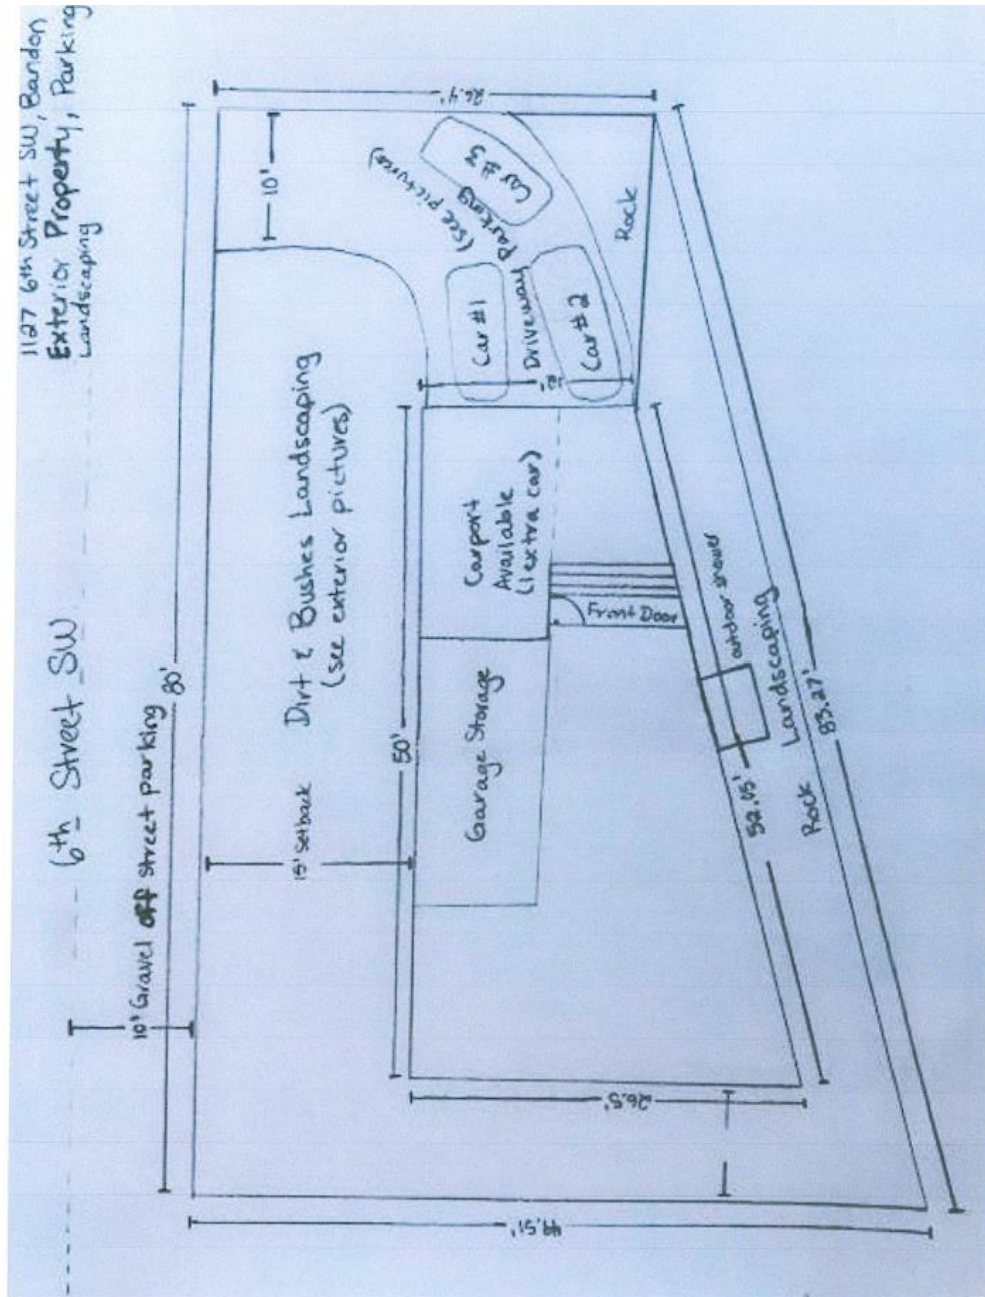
Off-street parking plan. Three off-street parking spaces provided.
